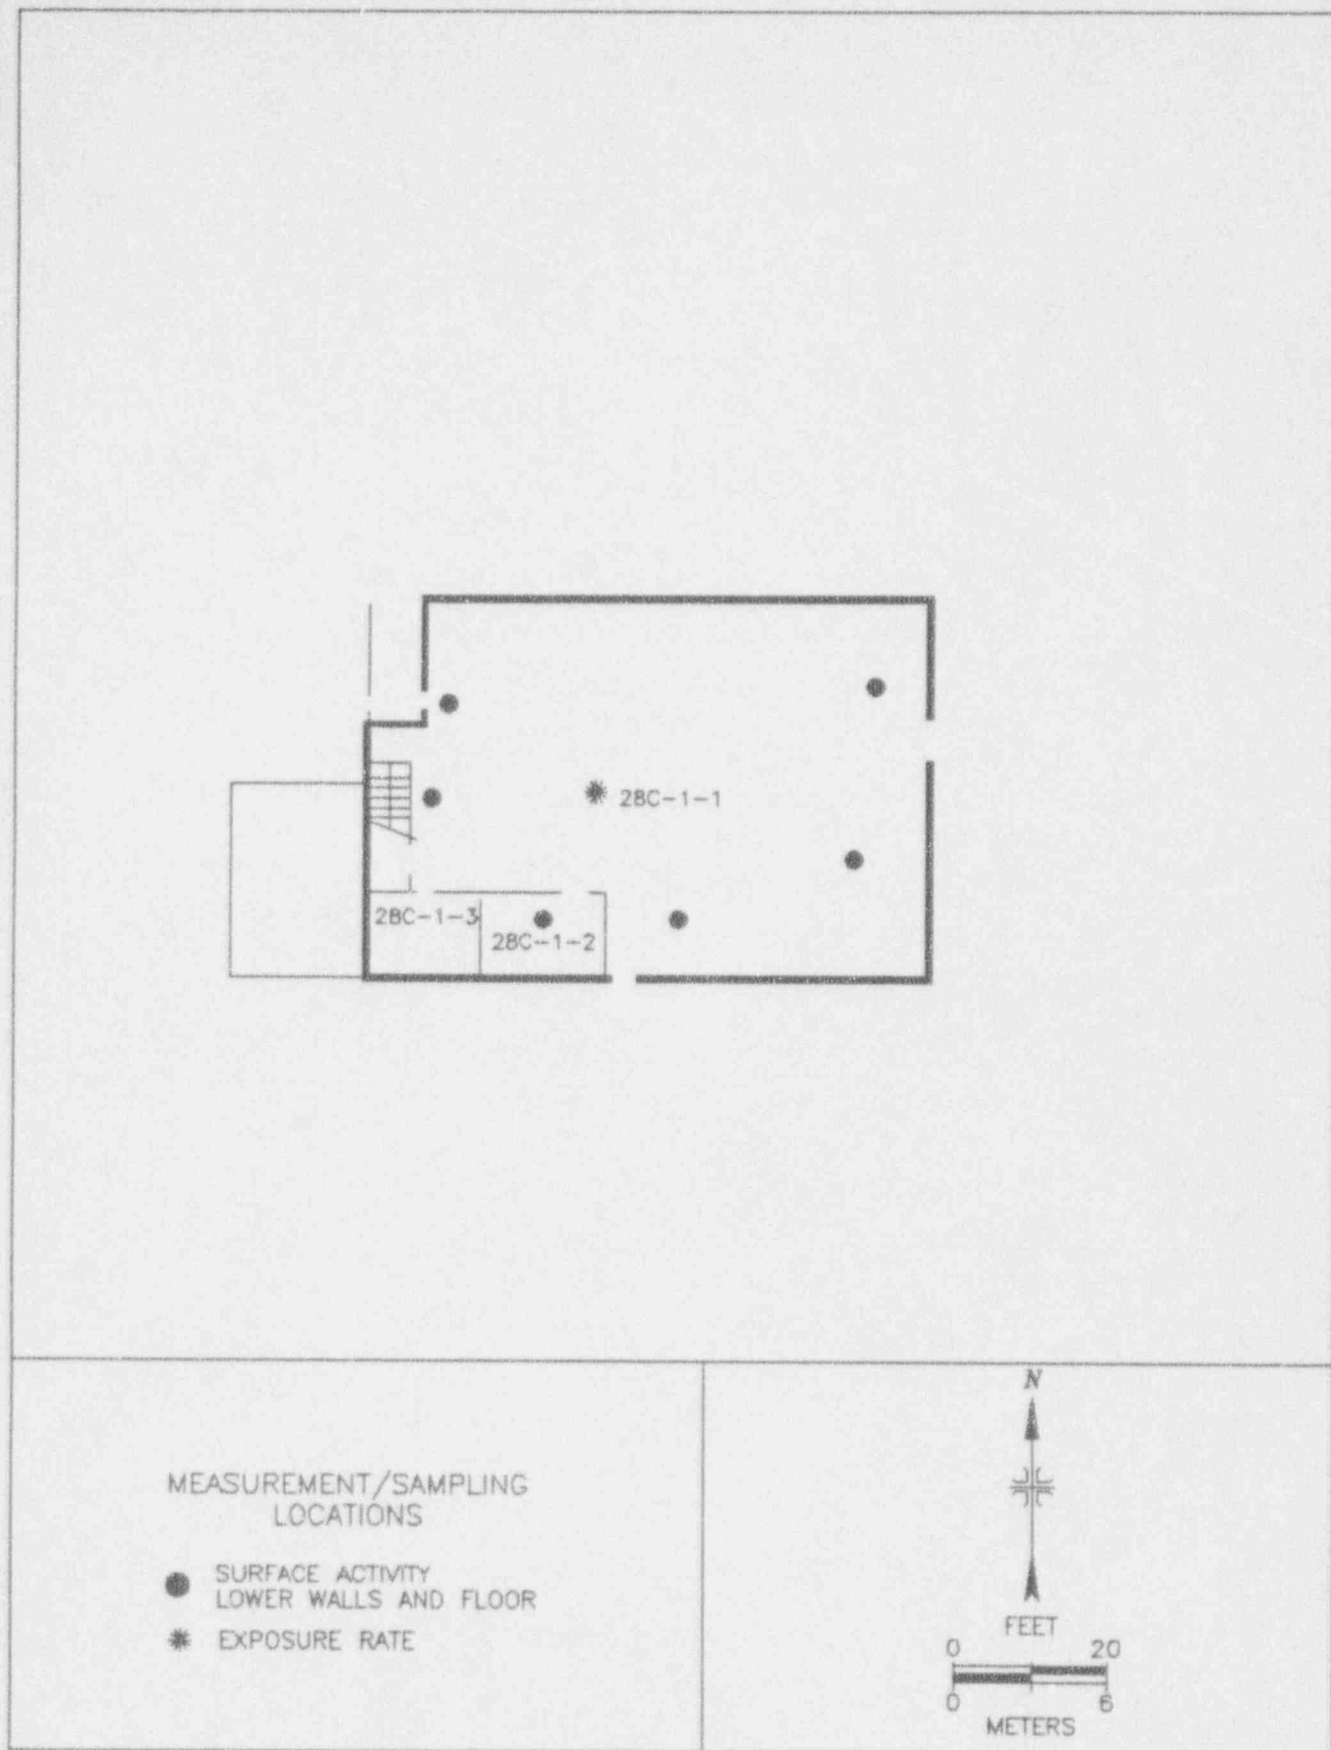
Building 5A, First Floor – Measurement and Sampling Locations
